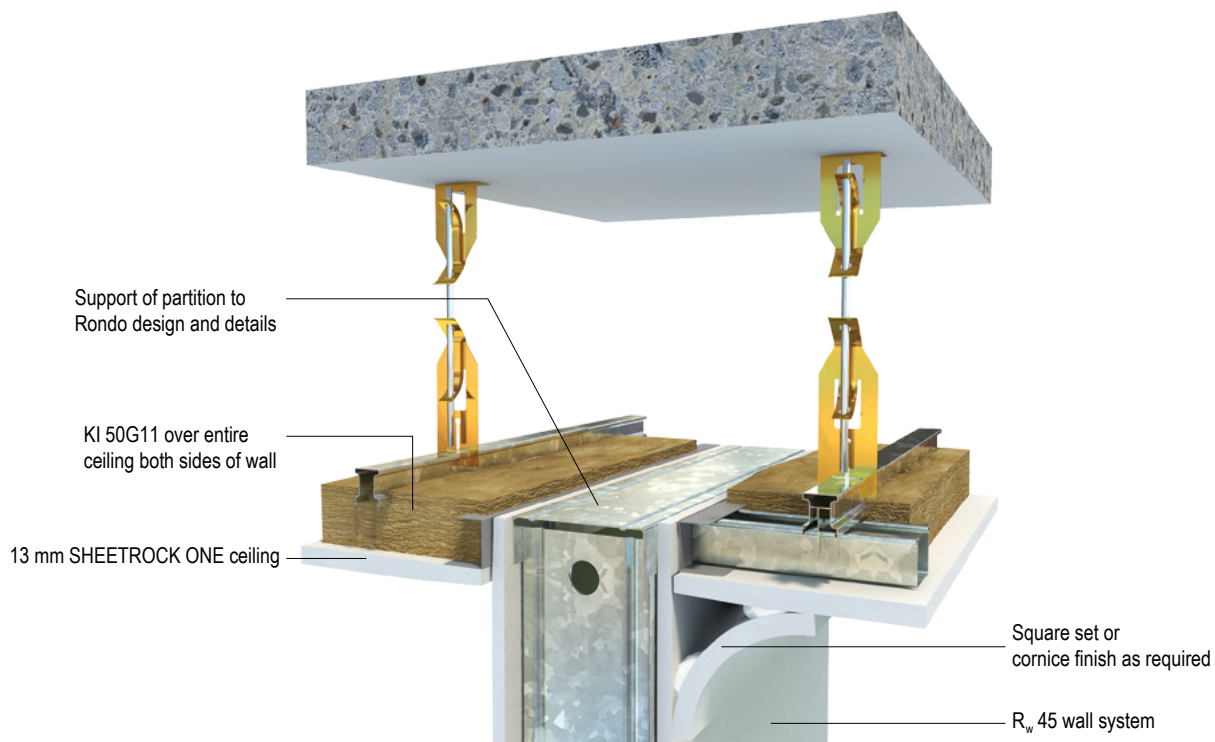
Ceiling configuration to maintain an R_w 45 wall acoustic rating (System OP.9 shown)
